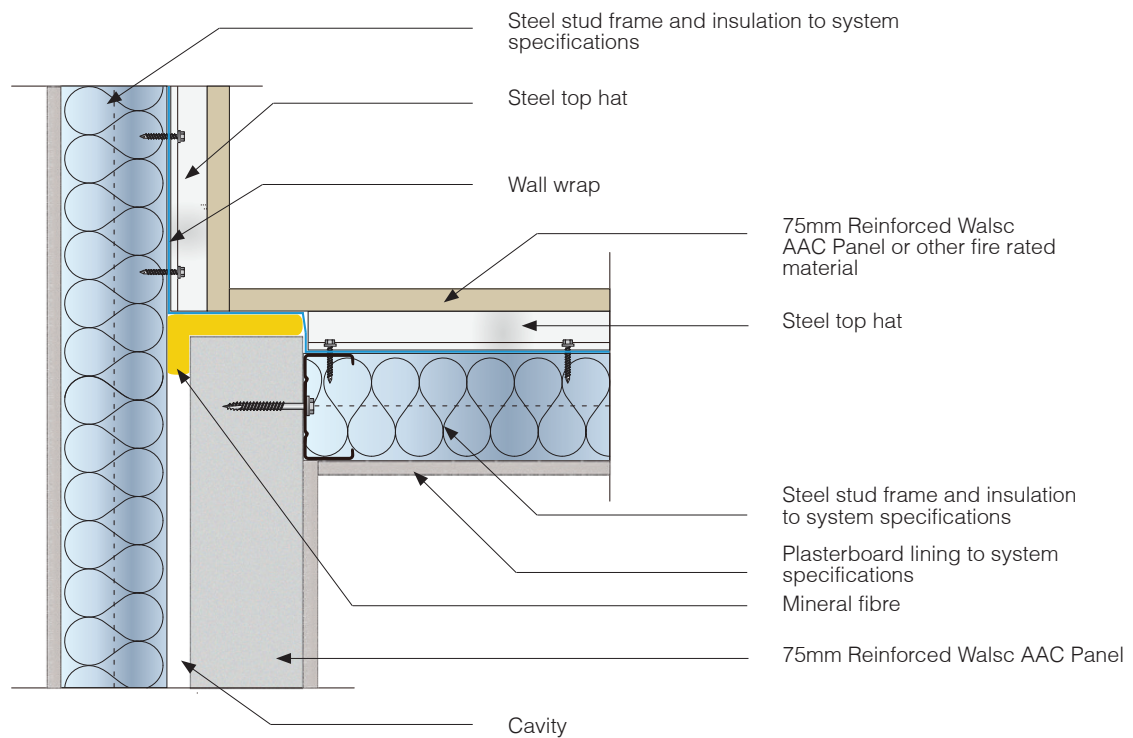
Inter-Tenancy Wall / Corridor Wall to External Wall Junction Detail 2
